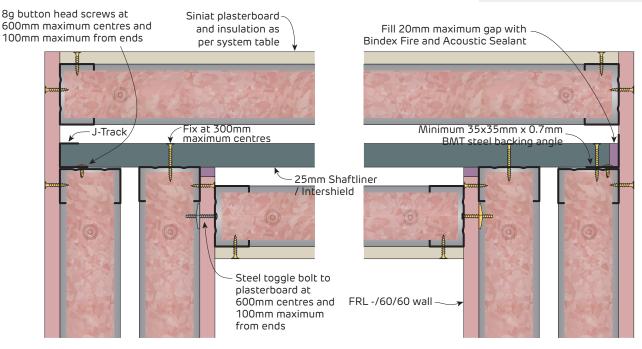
Interhome High-Rise Wall Connection to Fire Rated Plasterboard Wall Plan
